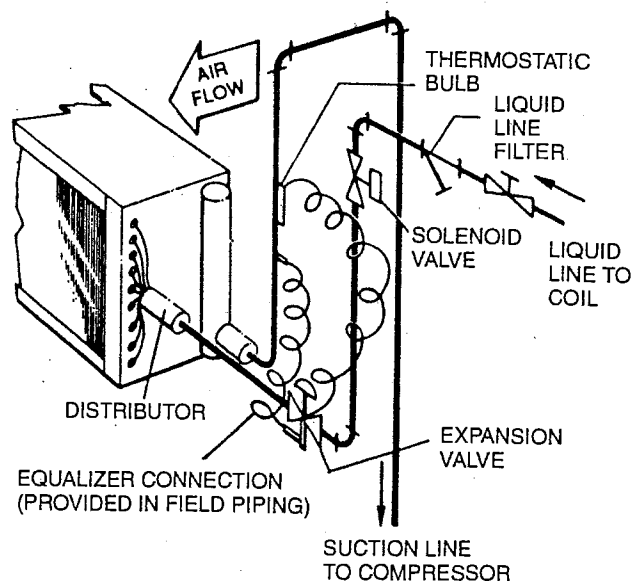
TYPICAL DX COIL PIPING ARRANGEMENT
